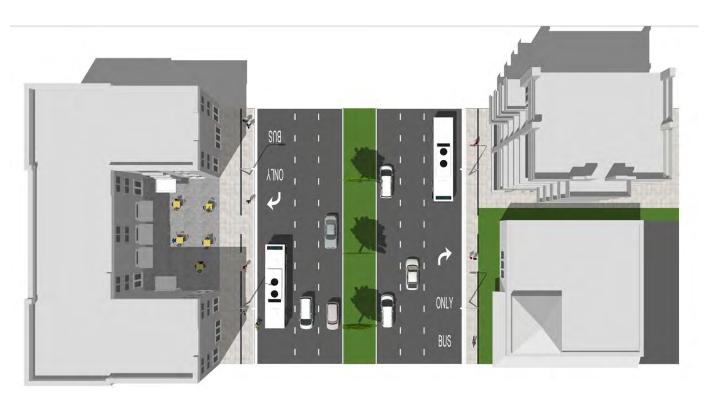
Alternative A aerial showing inconsistent sidewalk width
